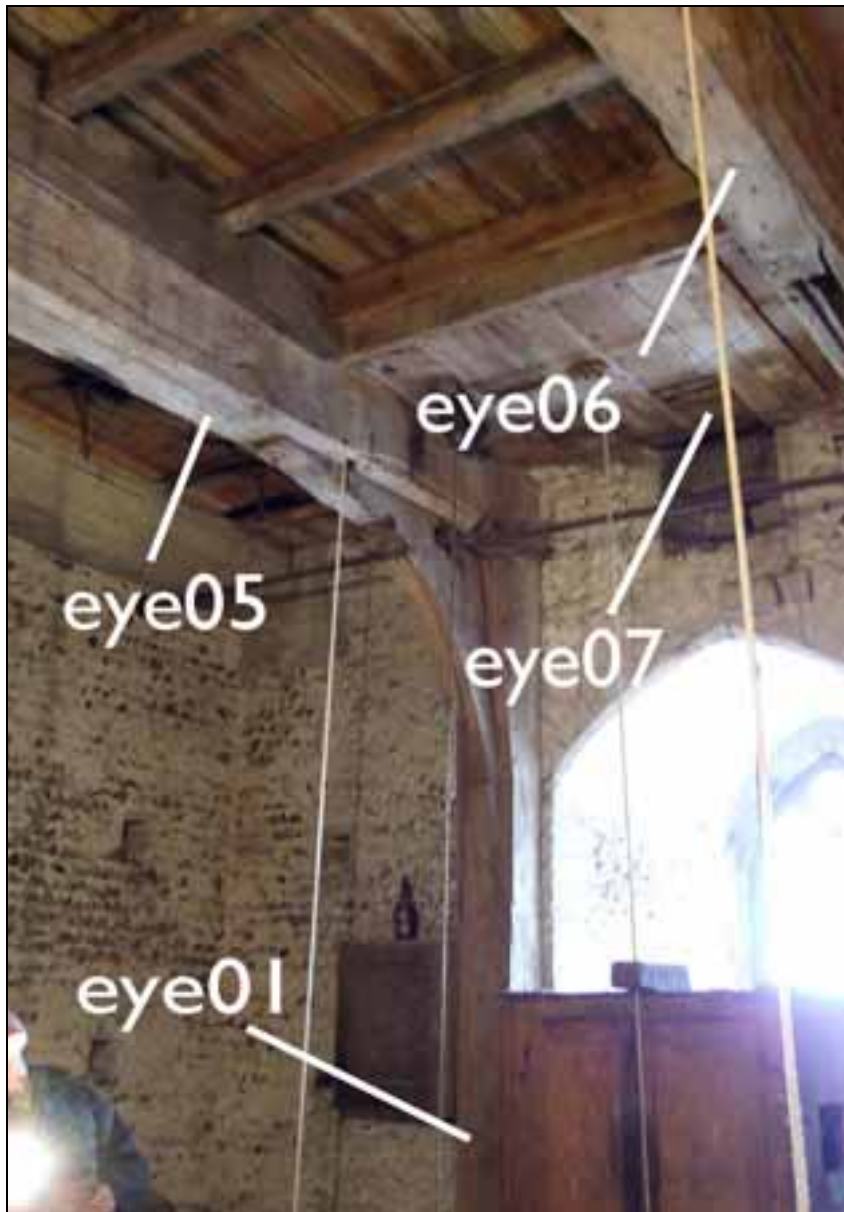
View of the belfry floor and supporting structure, looking south-west, showing some of the timbers sampled for dendrochronology
